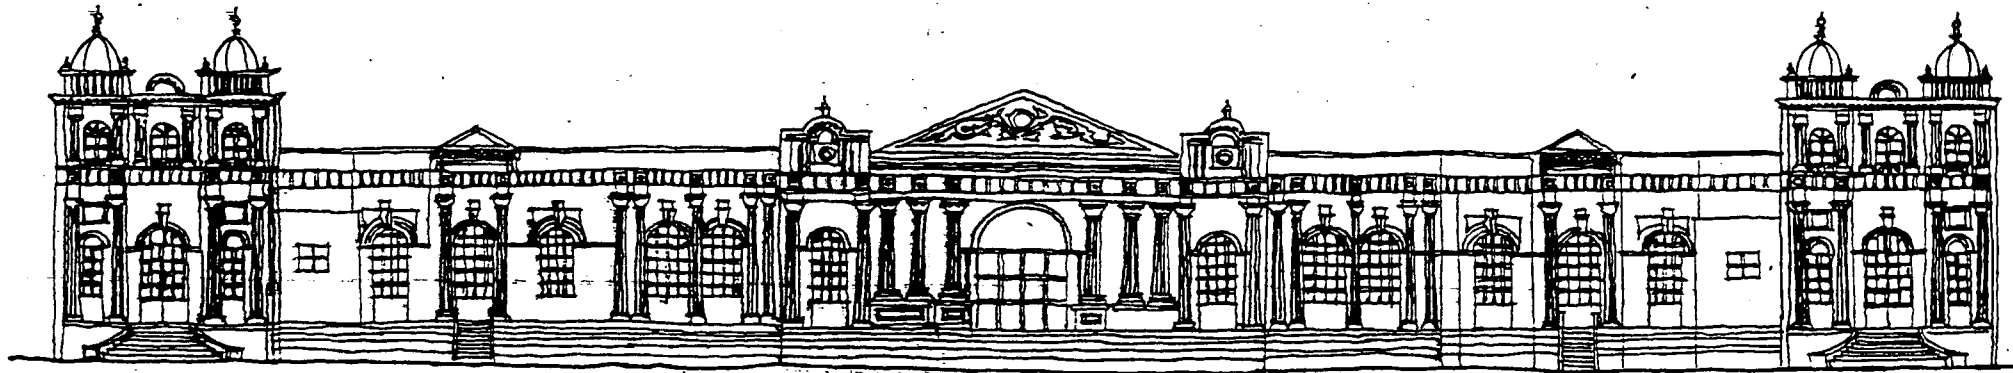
North elevation, Mymensingh rajbari
